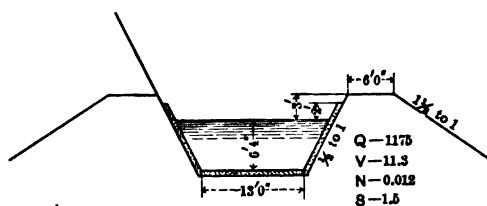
Typical Section of Lined Canal. Reclamation Service.
